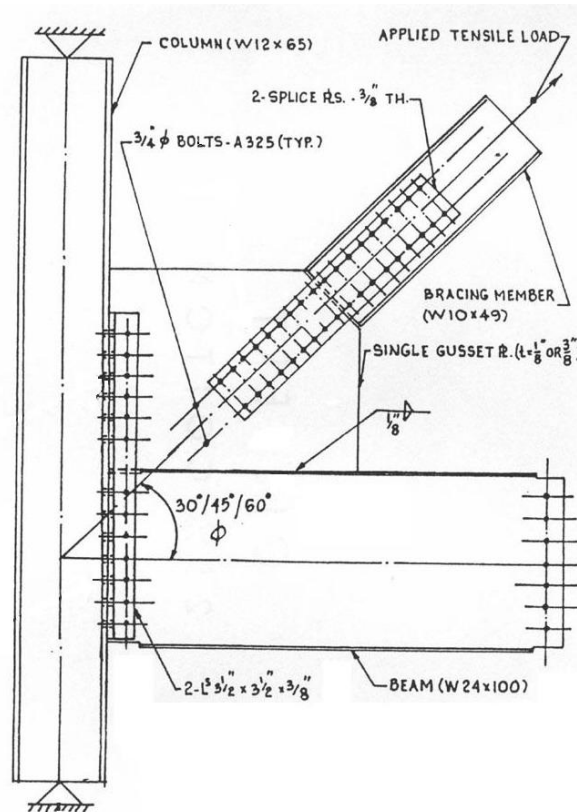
3 – Overall geometry of gusset plate with 30, 45 and 60 degrees bracing angle (Chakrabarti and Bjorhovde, 1983)
